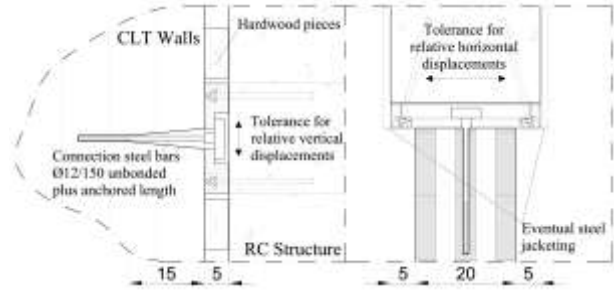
Sketches of the vertical distributed connection between CLT walls and RC vertical structural elements
